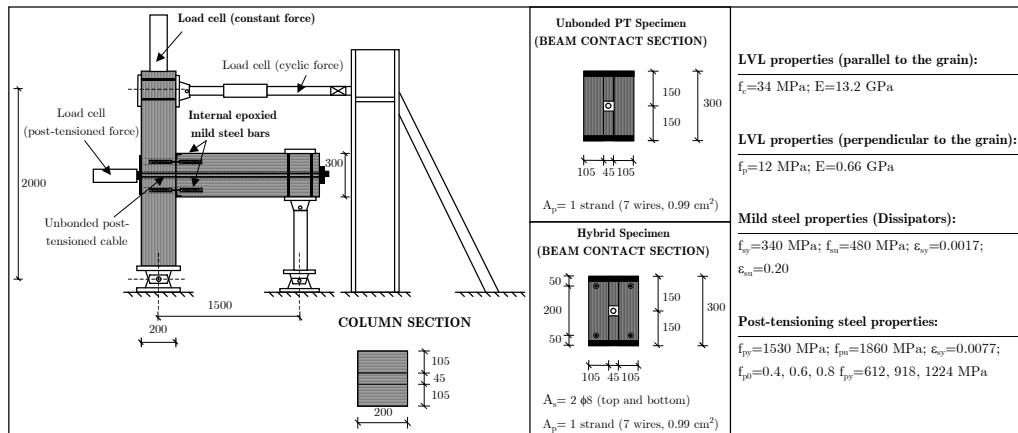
Test set-up, specimen details and material properties of LVL, post-tensioning and mild steel.
